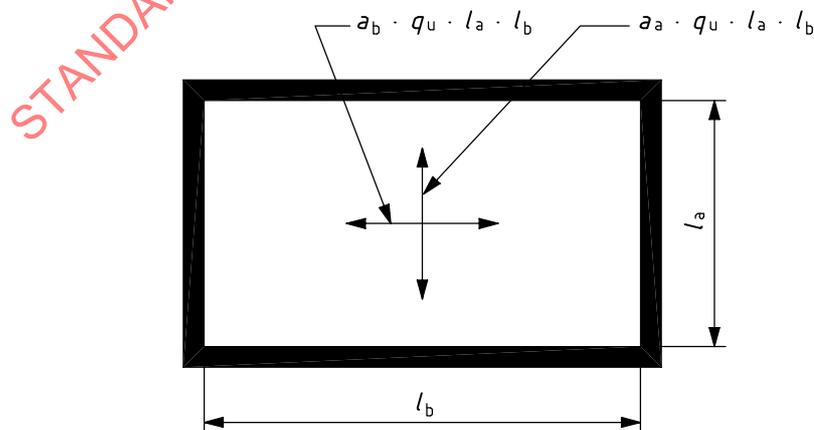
Fraction of the total load in the panel transmitted in each direction in two-way slabs supported on girders, beams or structural concrete walls
